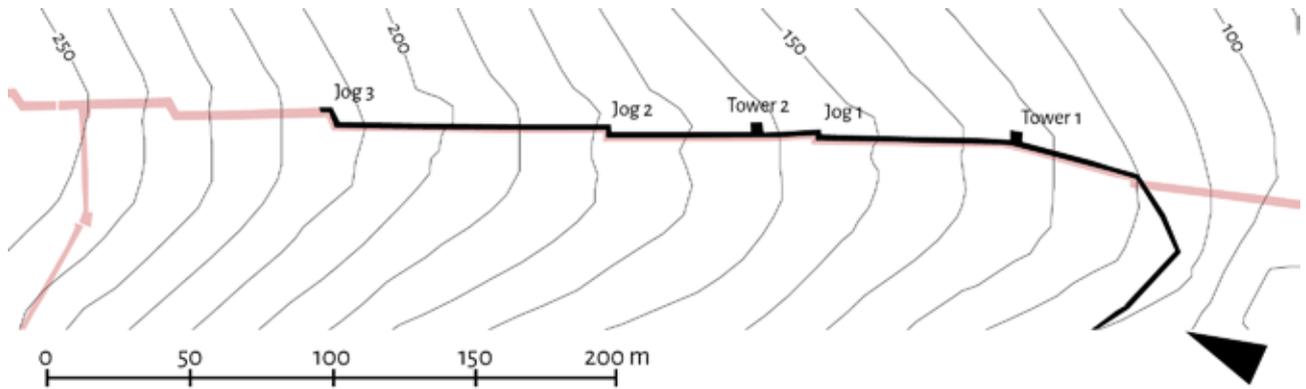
South-east descending wall. Phase 4 repairs, additions, and extensions (black) upon Phase 2A fortification wall (pink). Plan by R. Rönnlund.
